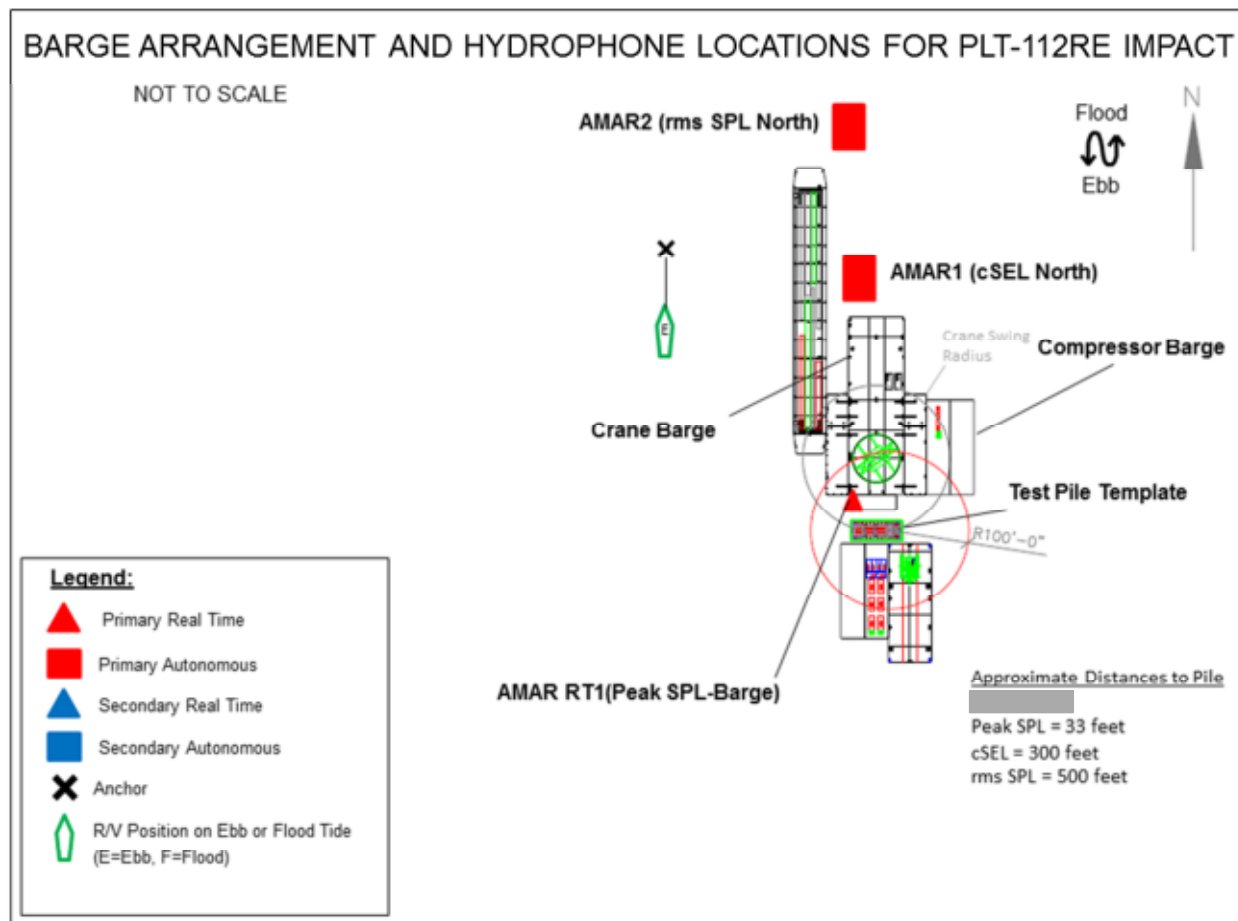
Plan view of pile and barge layout, 16 September 2013, Test Pile PLT-112RE.
